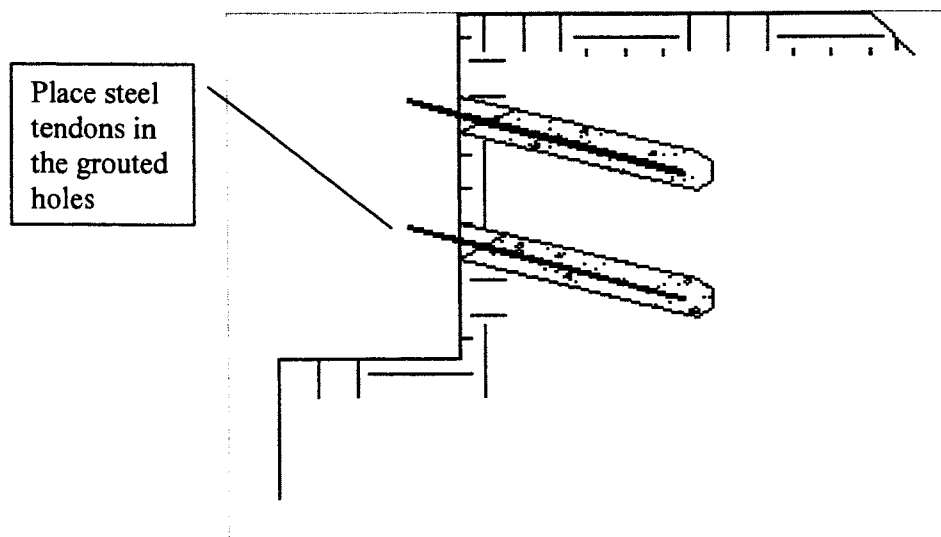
Picture showing step 4 of the construction process of Soil Nail wall
